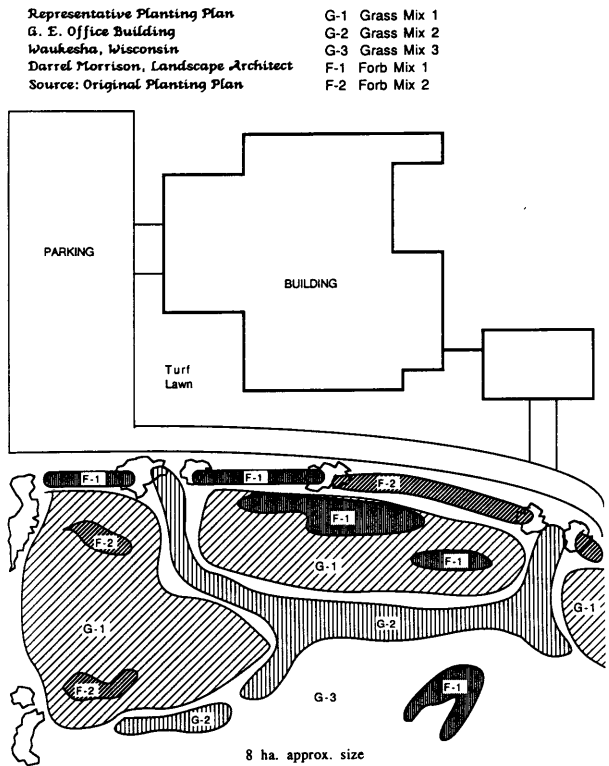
Representational planting plan for General Electric Office Building, Waukesha, Wisconsin. Darrel G. Morrison, Landscape Architect.
